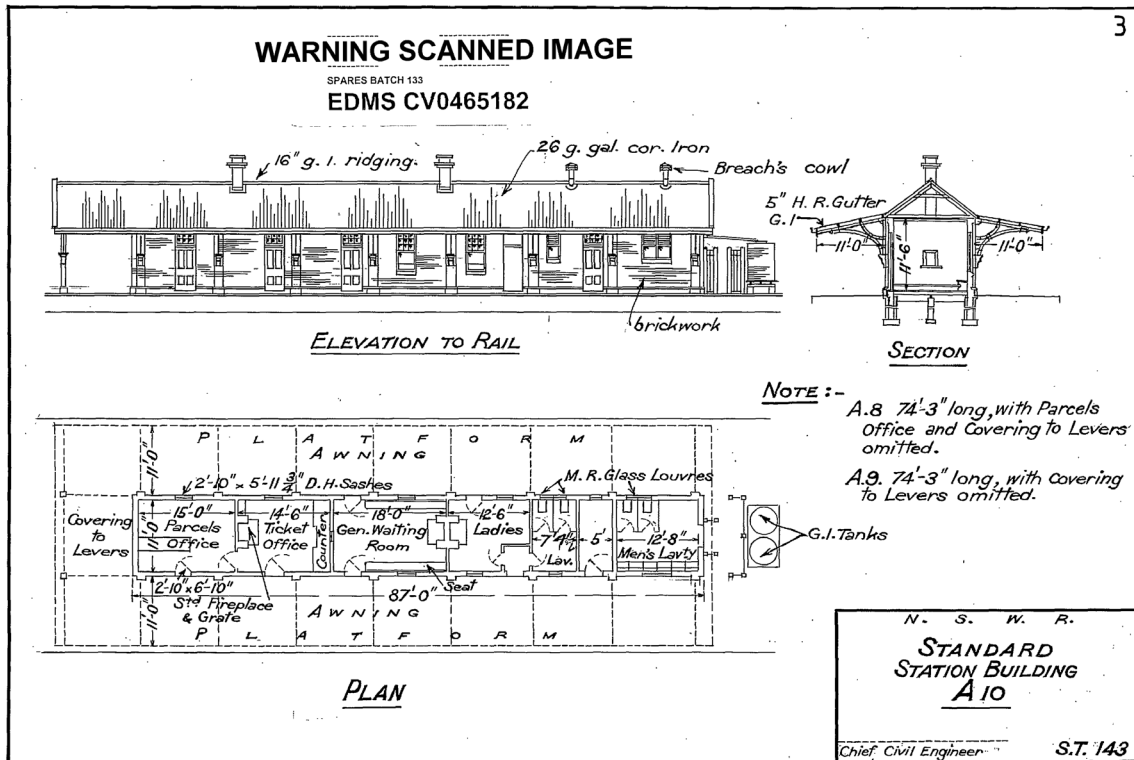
NSW standard Type 11 (A10) station building plan, n.d. (Virtual Plan Room).
